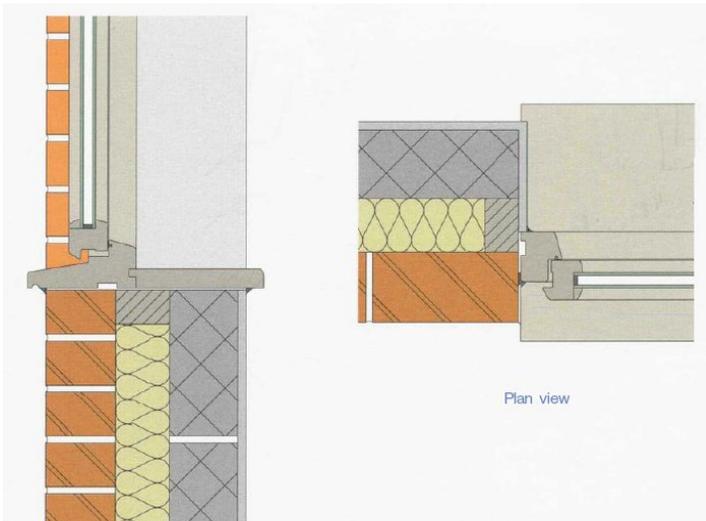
Robust Detail 3.12 – Masonry: Full-Fill Cavity Wall Insulation; Jambs and sills.
